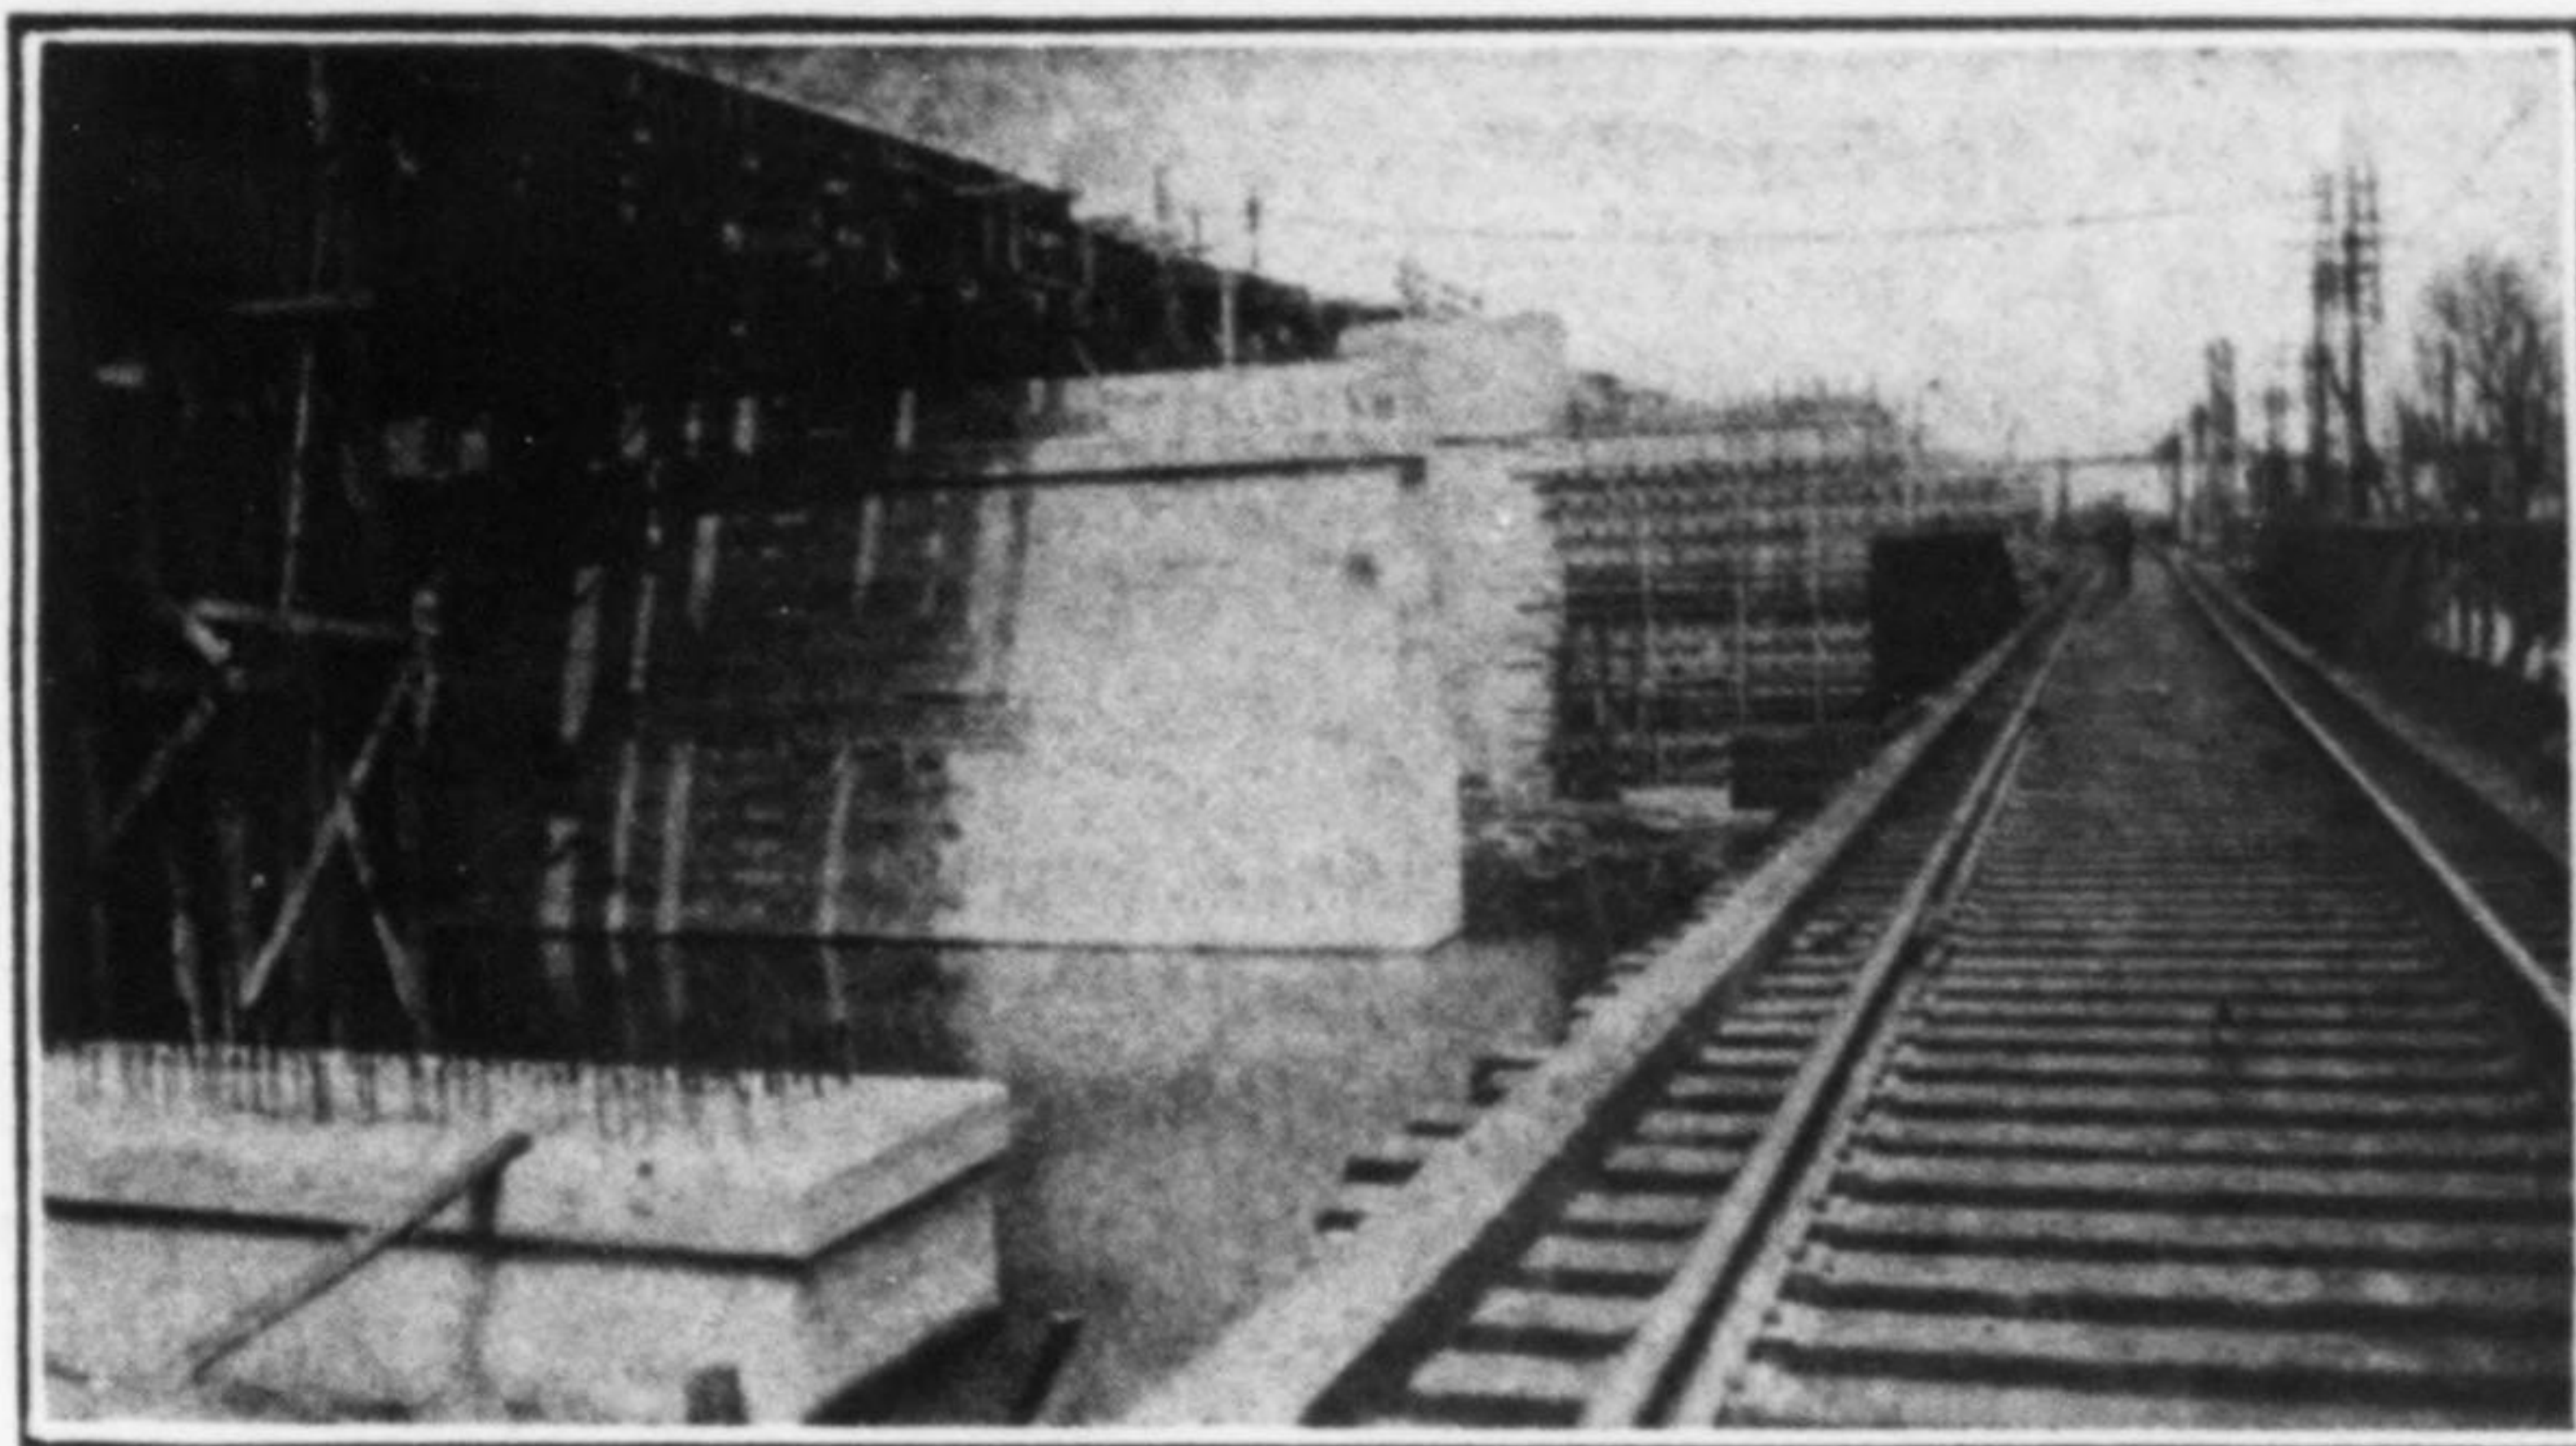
SUBSTRUCTURE FOR NEW BRIDGE
